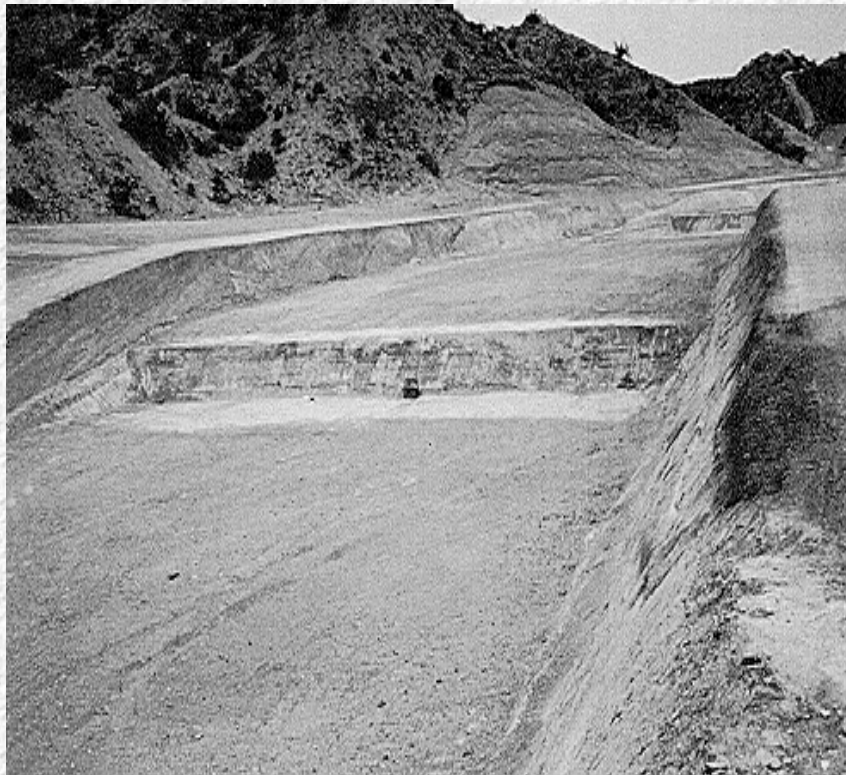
Soil Cement Bank Protection and Drop Structures in Laughlin, NV (Hansen)
